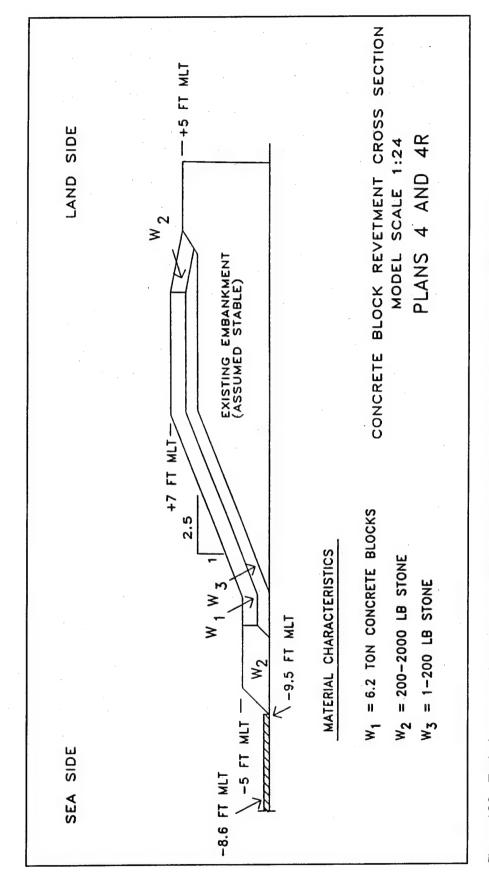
Typical cross section of concrete-block revetment for preventing erosion, Sargent Beach, Texas
